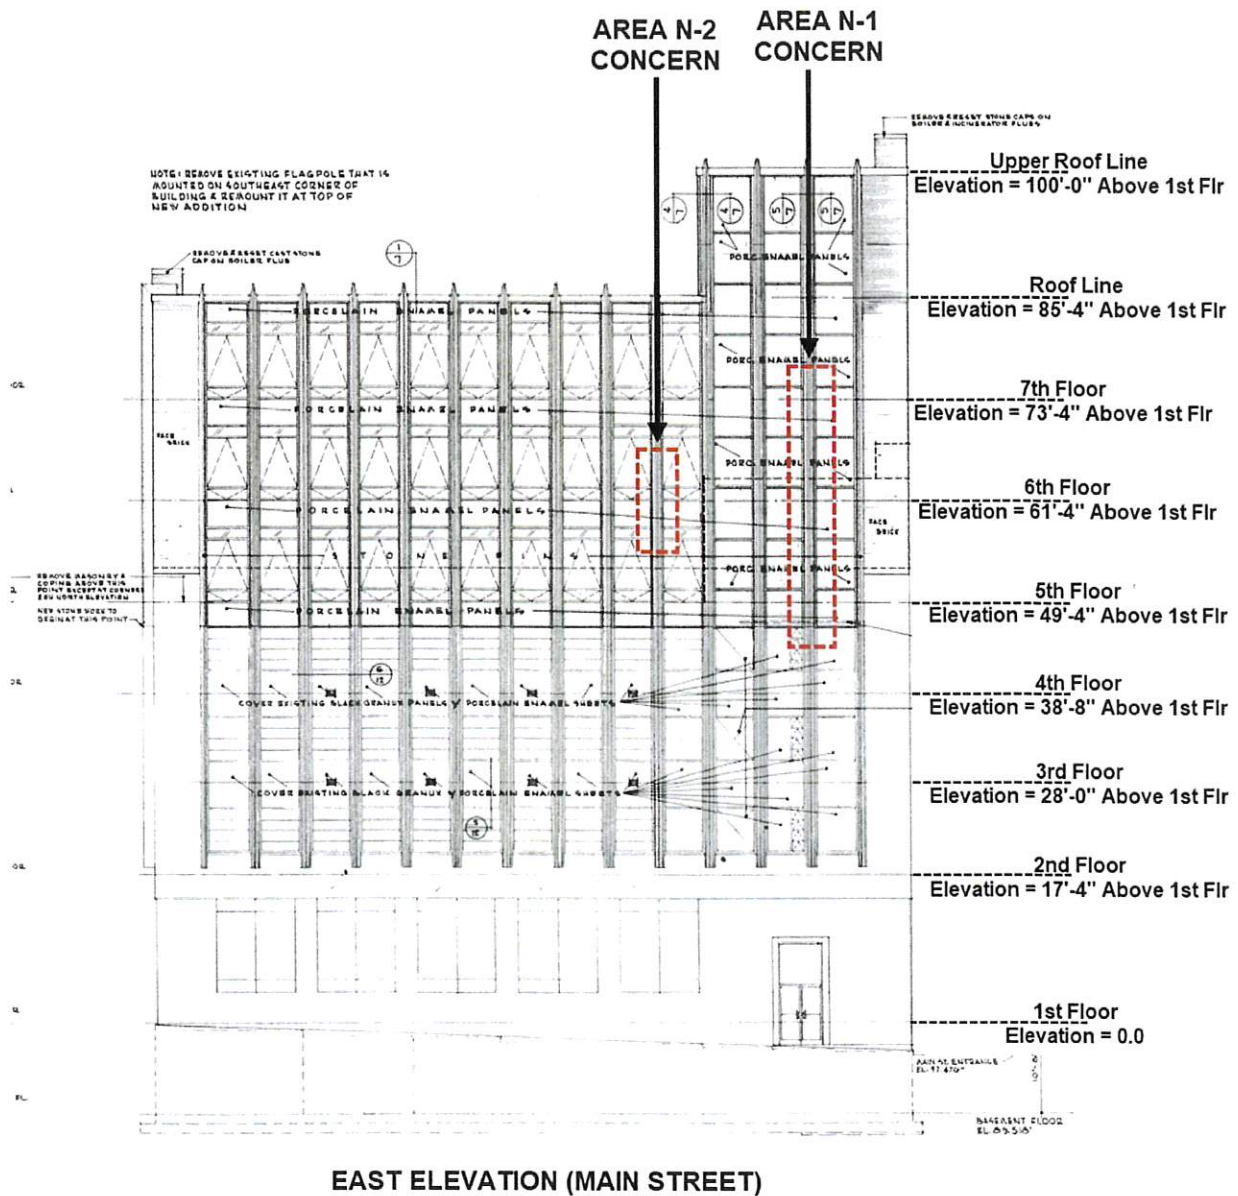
Elevation Showing Wall Areas That Have Lost Substantial Lateral Support
